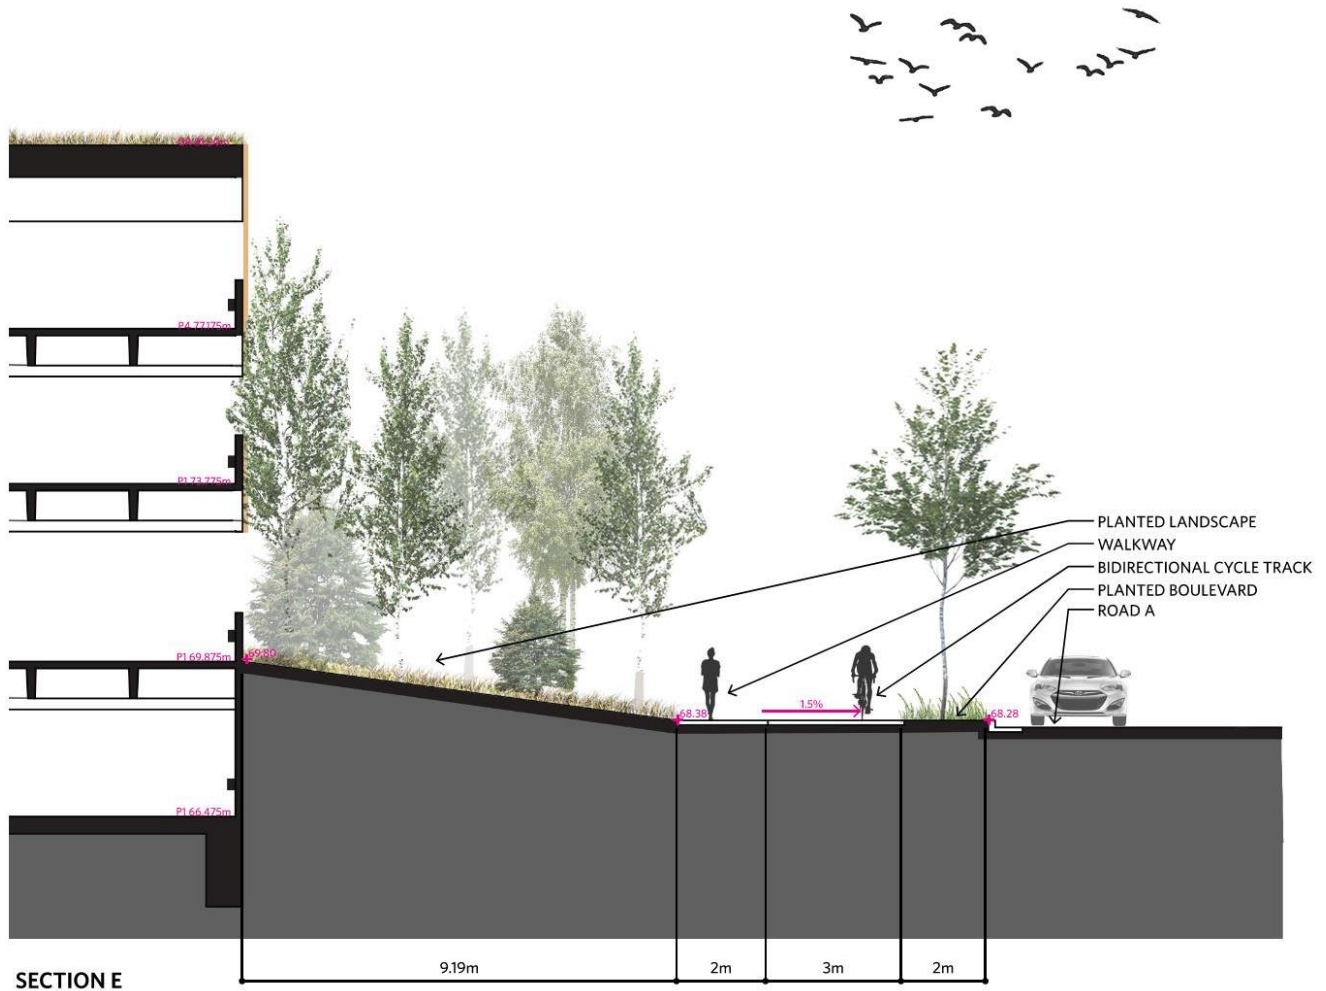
illustrates that on Road A, the Parking Garage is effectively one level below grade. Pedestrians and vehicles will enter the garage on Level P2
